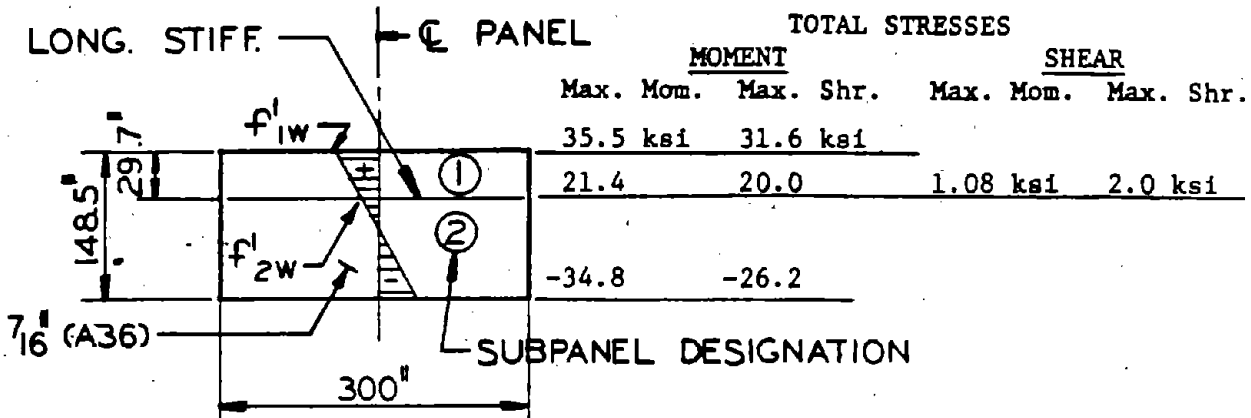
WEB PANEL - POSITIVE MOMENT DESIGN - PROPOSED
